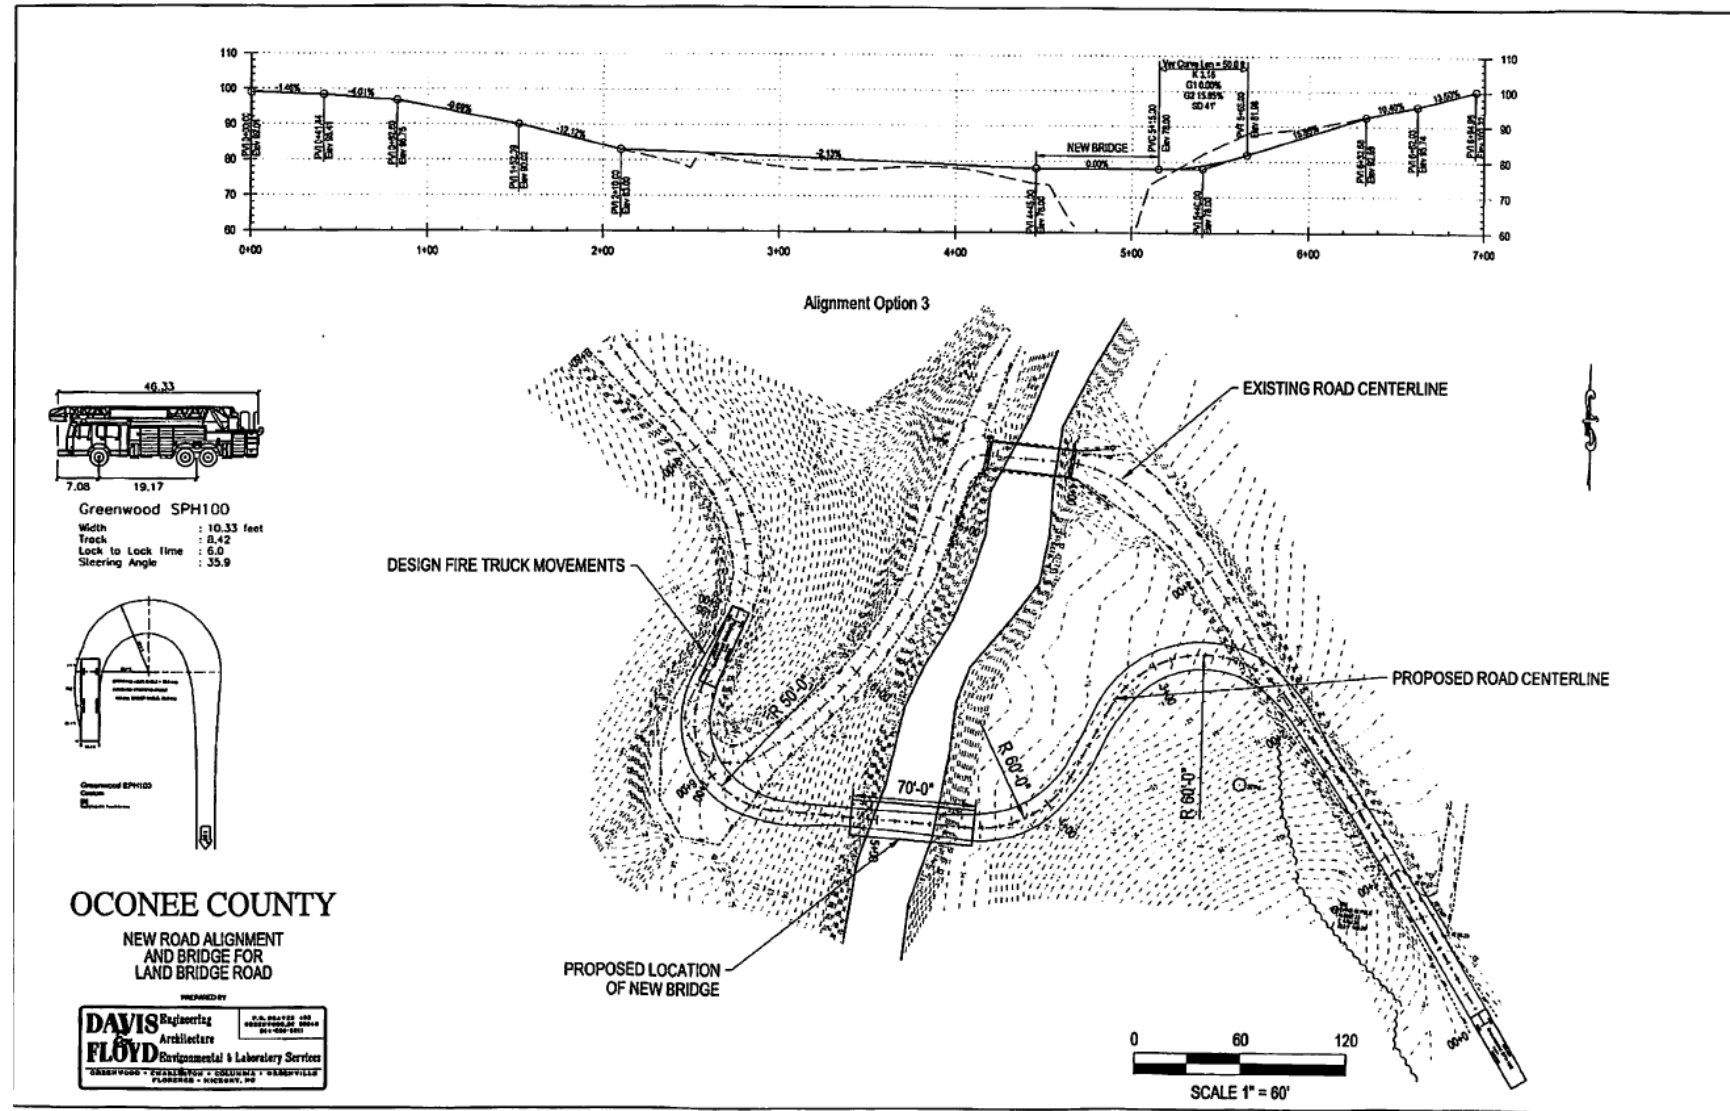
LAND BRIDGE NEW ROAD ALIGNMENT
